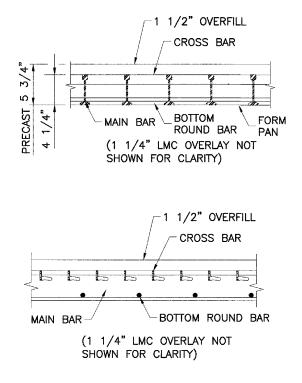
Grid deck sections looking perpendicular to traffic in upper view and parallel to traffic in lower view.
